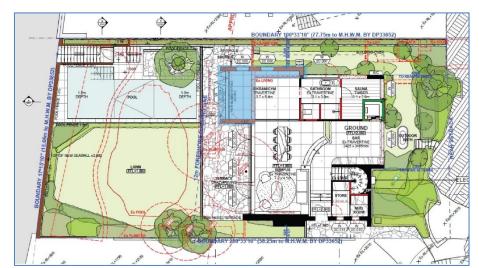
The proposed extension beneath the master bedroom on the ground floor (shaded blue) is not approved.
